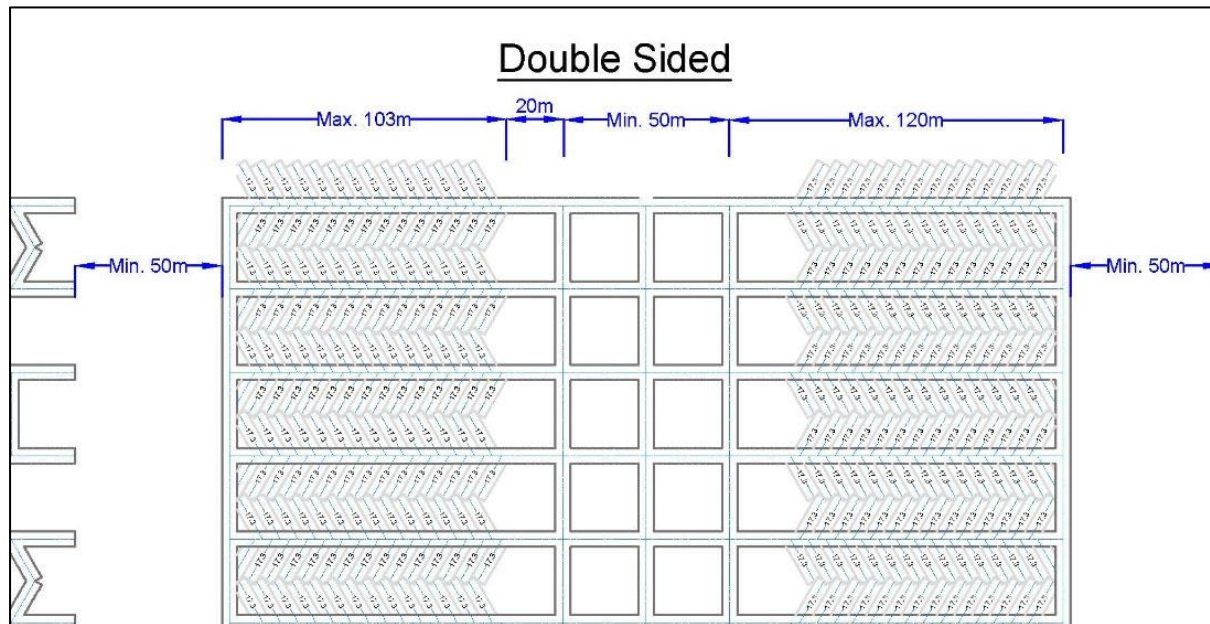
Proposed double-sided lifting secondary extraction layout for Zone B
